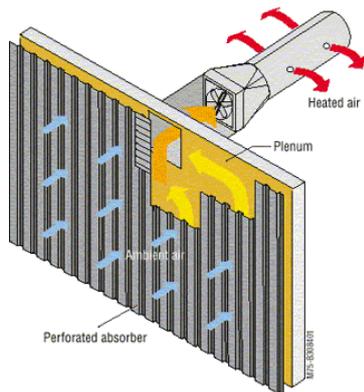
Working Principle and Application of Solar Wall (www.solar-designs-inc.com, www.solarwall.com)
